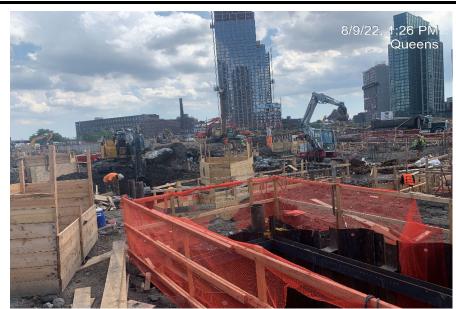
Styrofoam blocks installed in WC-05, WC-06. View facing West.
